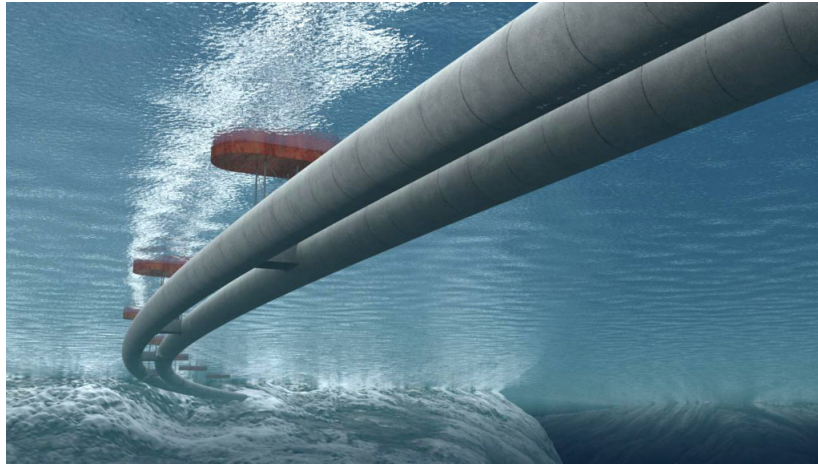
TLP-supported floating bridge on the Bjørnafjord crossing
